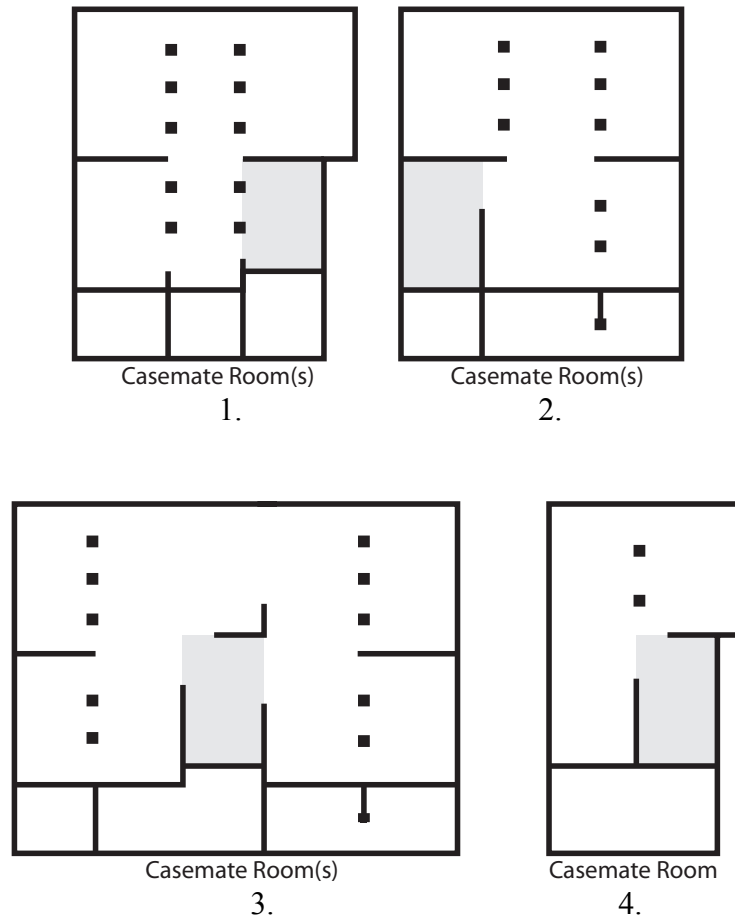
Possible Reconstructions of the Plan of the Building Housing the Textile Workshop (the gray area indicates the textile workshop), Drawing by Seung Ho Bang.
